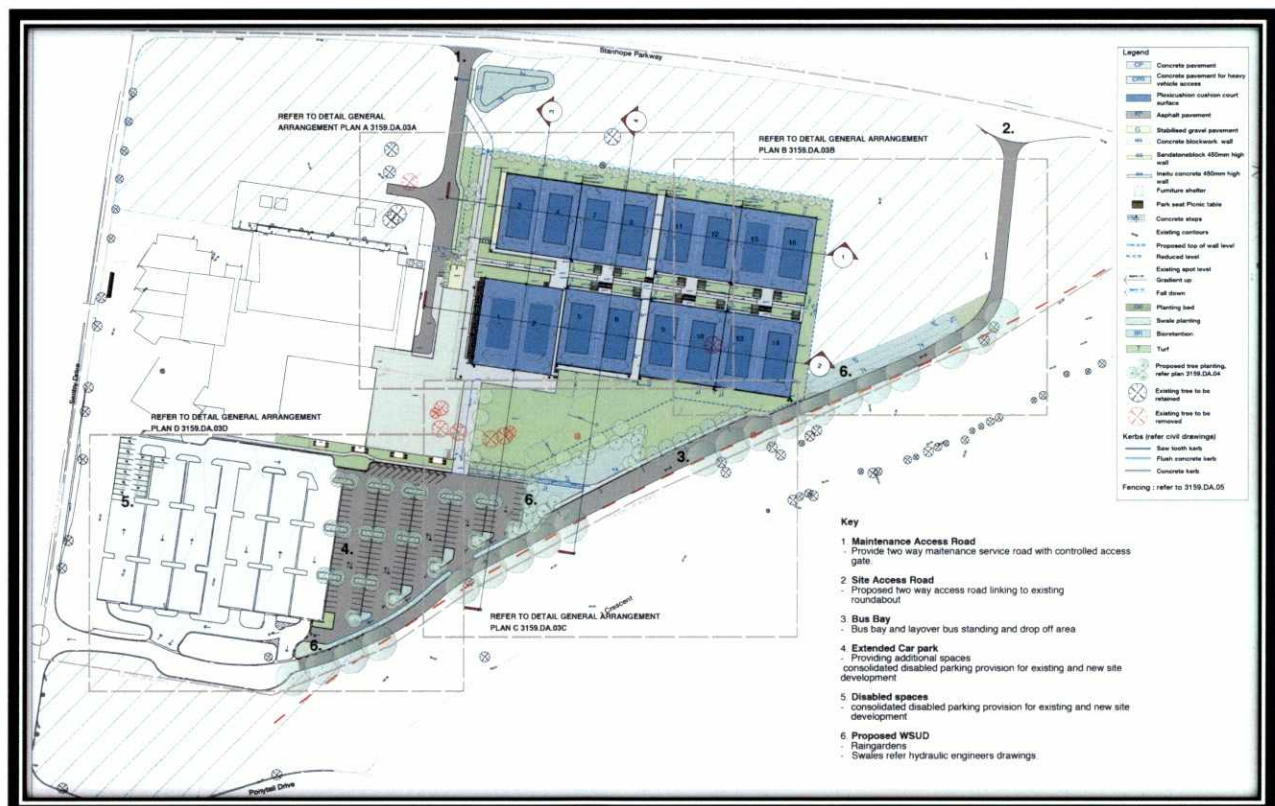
Site/Landscape Plan (Source: AJ+C, 2013)
